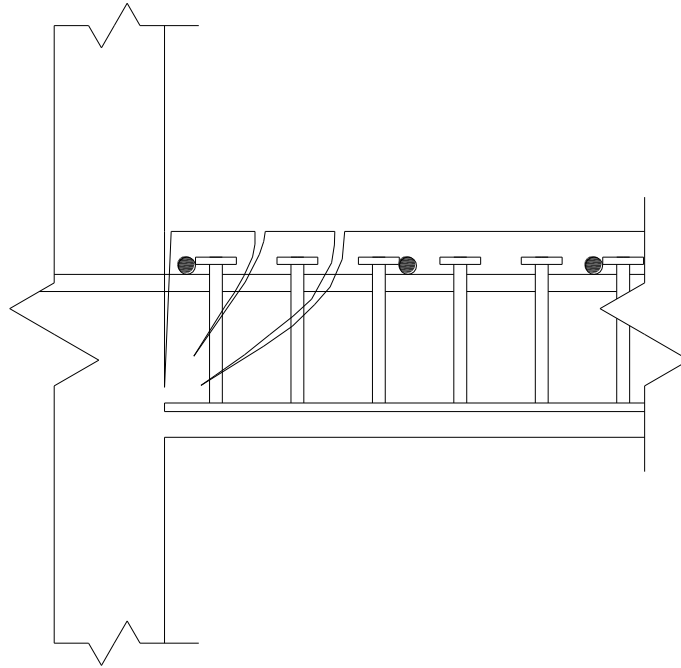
Schematic of Traditional Shear Failure Mechanism Governed by Diagonal Shear Cracking Bridged by Shear Stud Reinforcement
